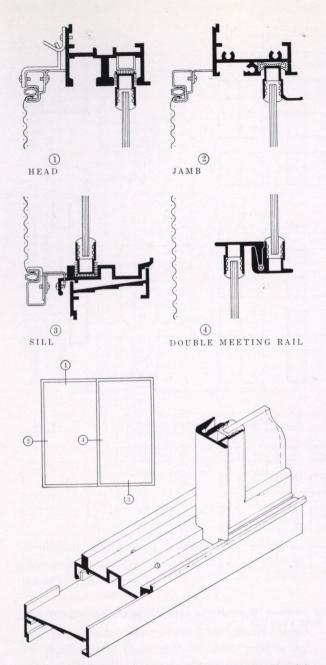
Horizontal sliding windows for residential type buildings, showing standard sizes and details. The double sill drains off both wind driven water and moisture from interior condensation. Concluded on Page 234.
